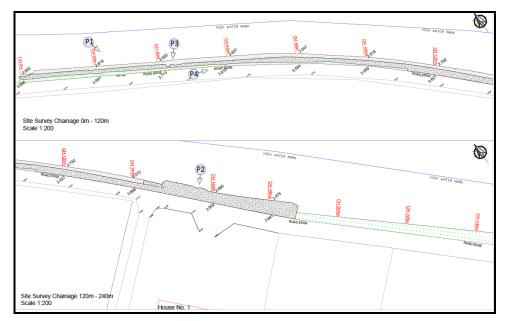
Extract from Drawing No. CE-2021-02-01 Proposed Coastal Protection Works
